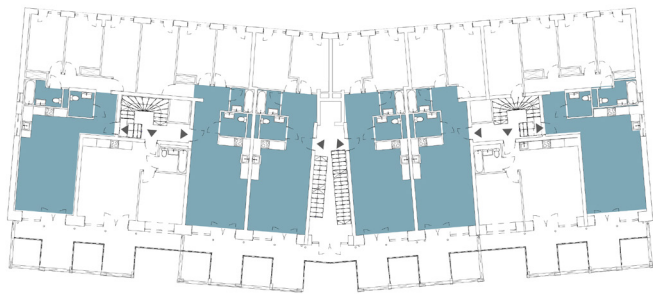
Shared Spaces, Typical Floor - Soubeyran / Geneva
